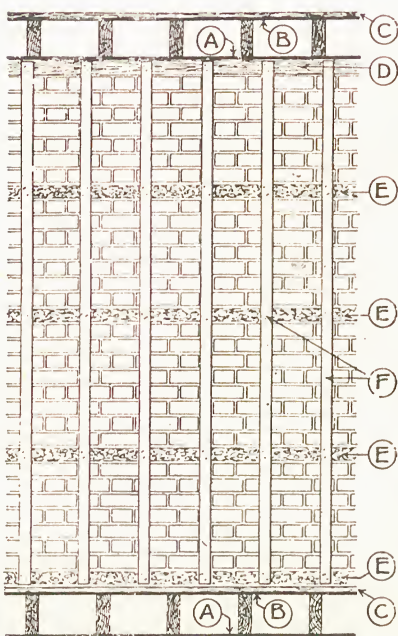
Methods advised for fixing “Sundeala” wall-board.
